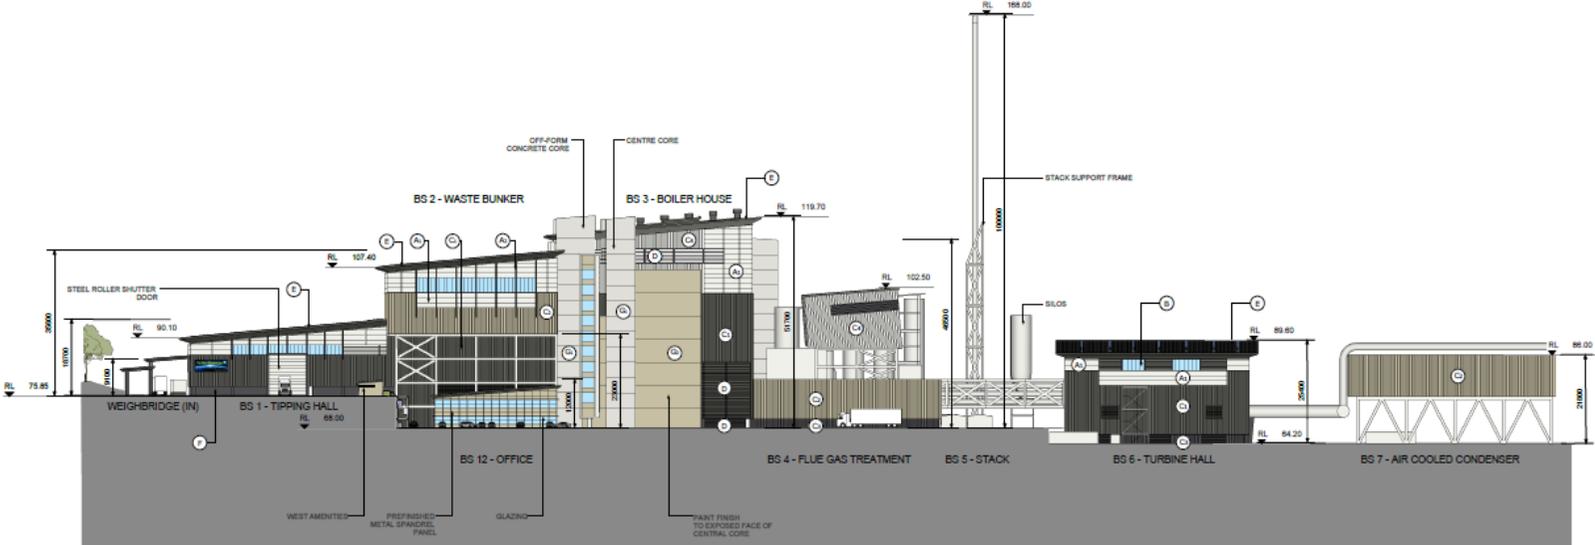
Eastern Elevation (source: Krikis Taylor Architects, 2017)
